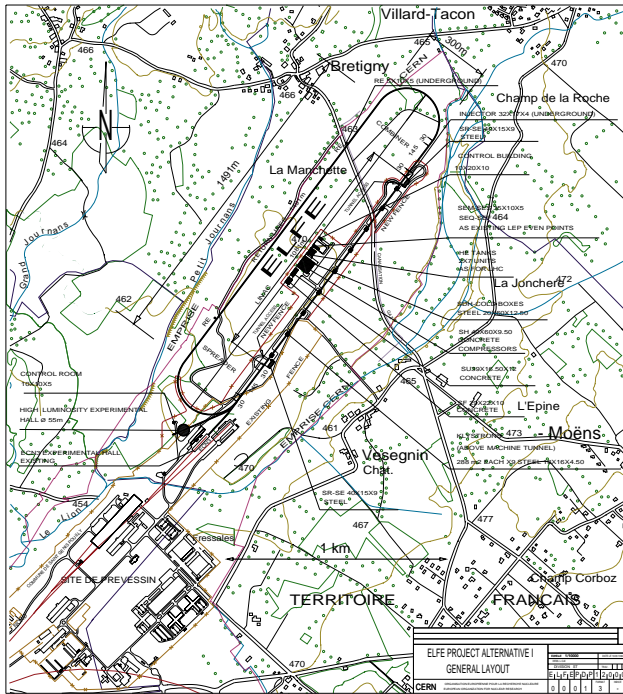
ELFE on CERN Site. The laboratory and office buildings of the Preveessin site are shown in the lower left corner.
